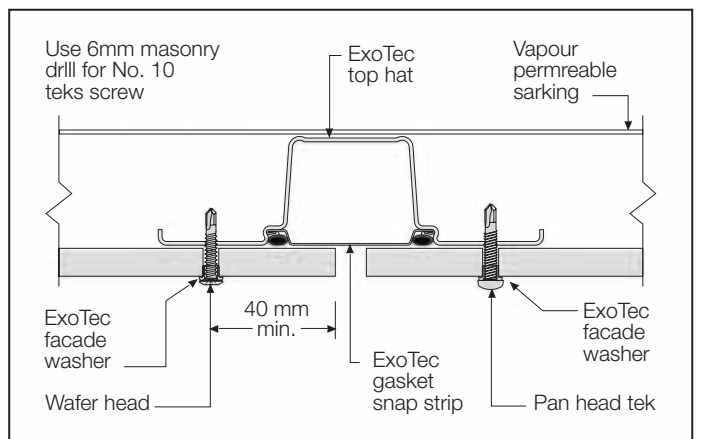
EXPOSED HEAD FASTENER DETAIL
